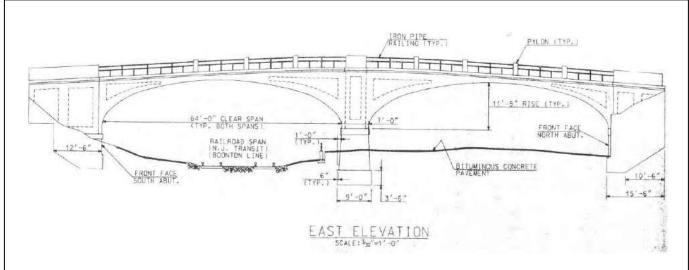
General Elevation of the Existing Landing Road Bridge
